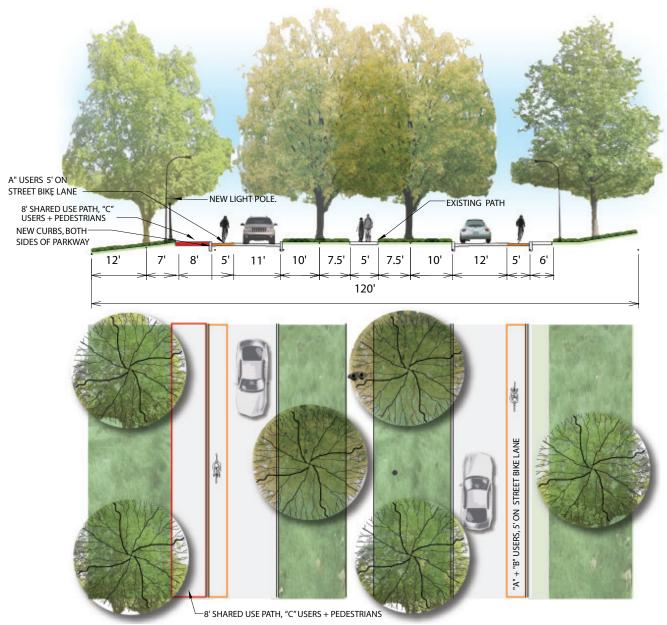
Eastern Parkway: Zone 3 Prototypical Section & Plan - Baxter Avenueto Barret Avenue
